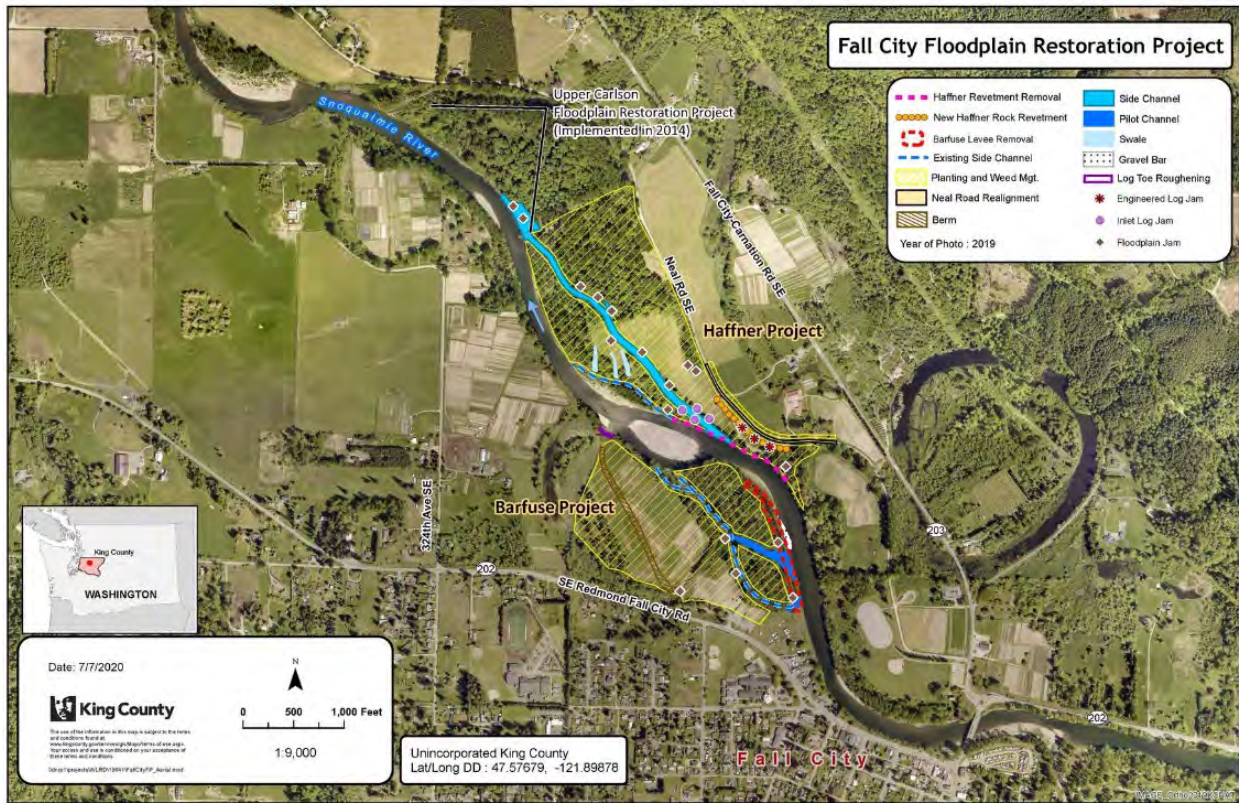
Site Plan for Fall City Floodplain Restoration Project
